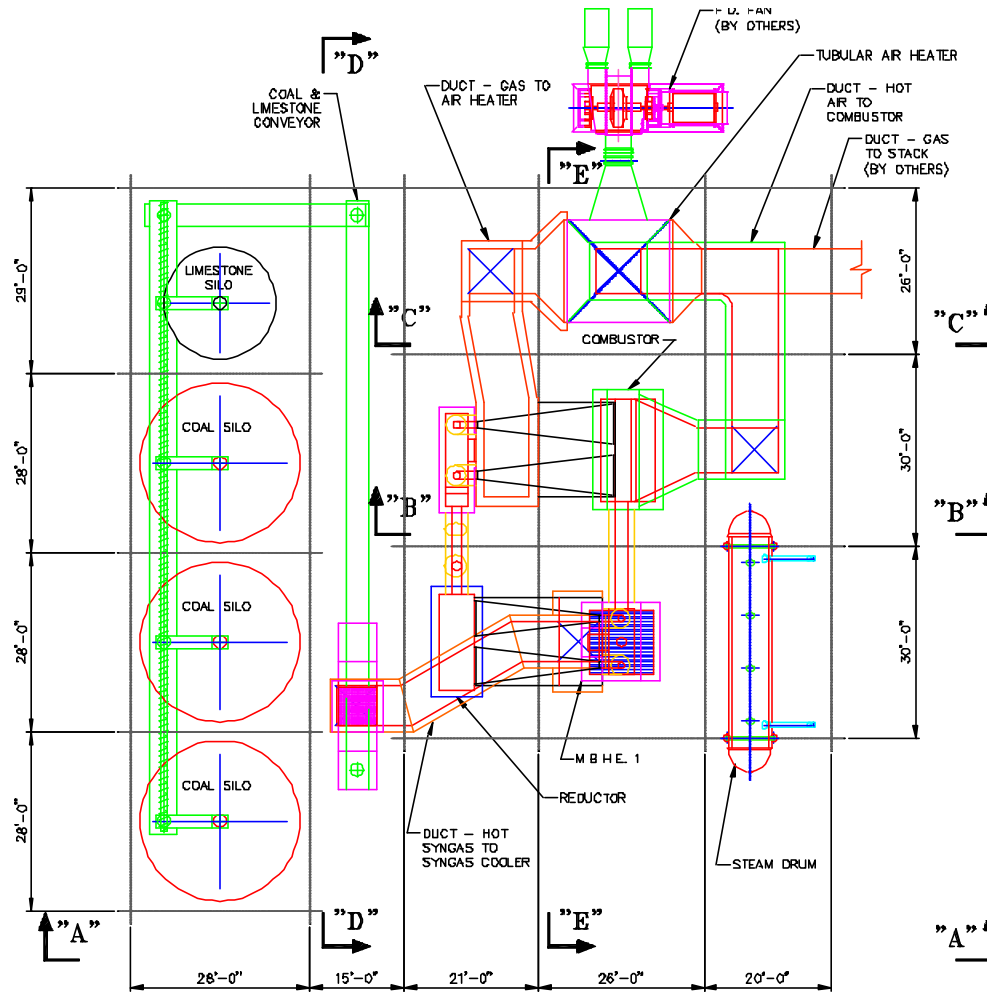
4: Case-12 Gasifier Island General Arrangement Drawing – Plan View
